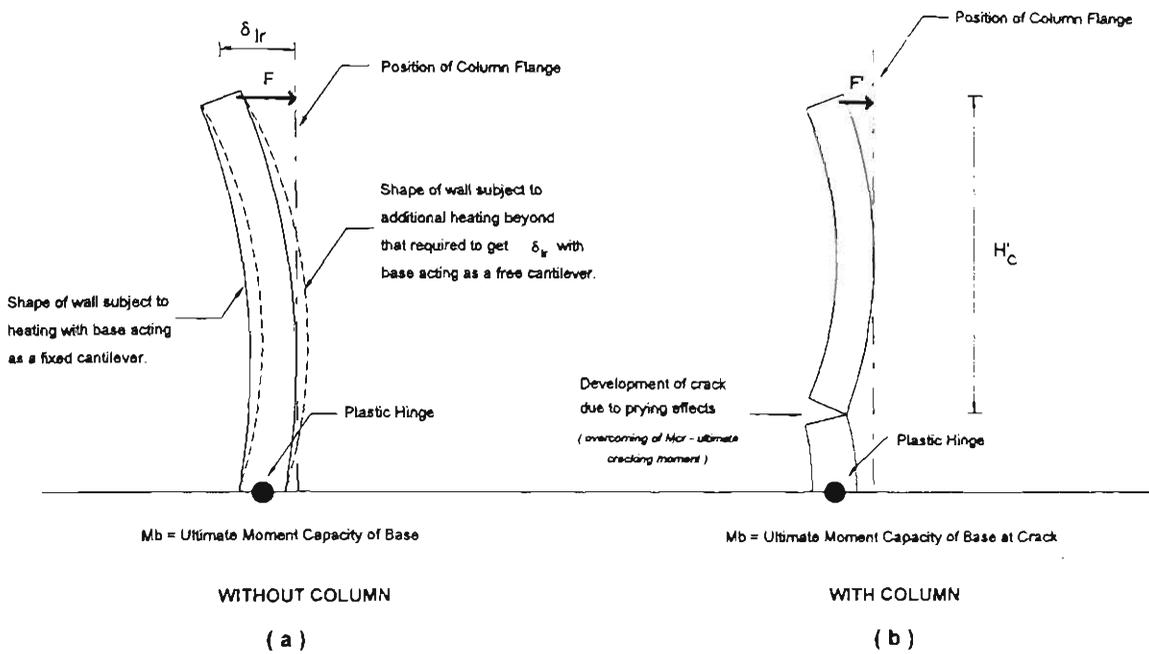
Wall Deformation Effects With and Without Supporting Structure
